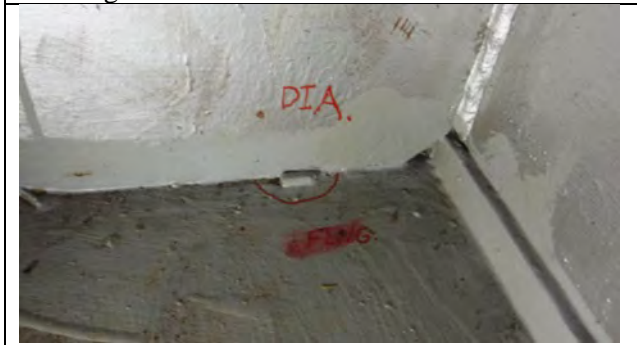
View of Tack Weld on Cap Bottom Flange at the Cap North Web, East of Girder 3. Looking North.
